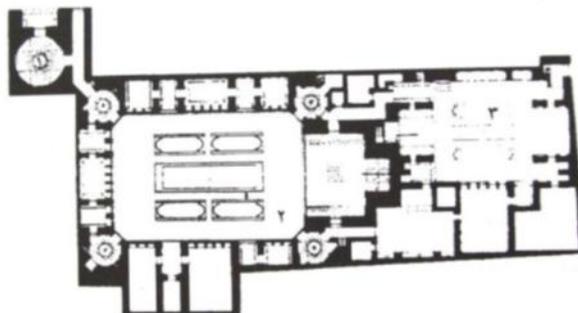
Yazd, Dr. Mortaz's House with Internal and Exterior Space (1. Entrance, 2. Internal, 3. External) (Memarian, 2008).
